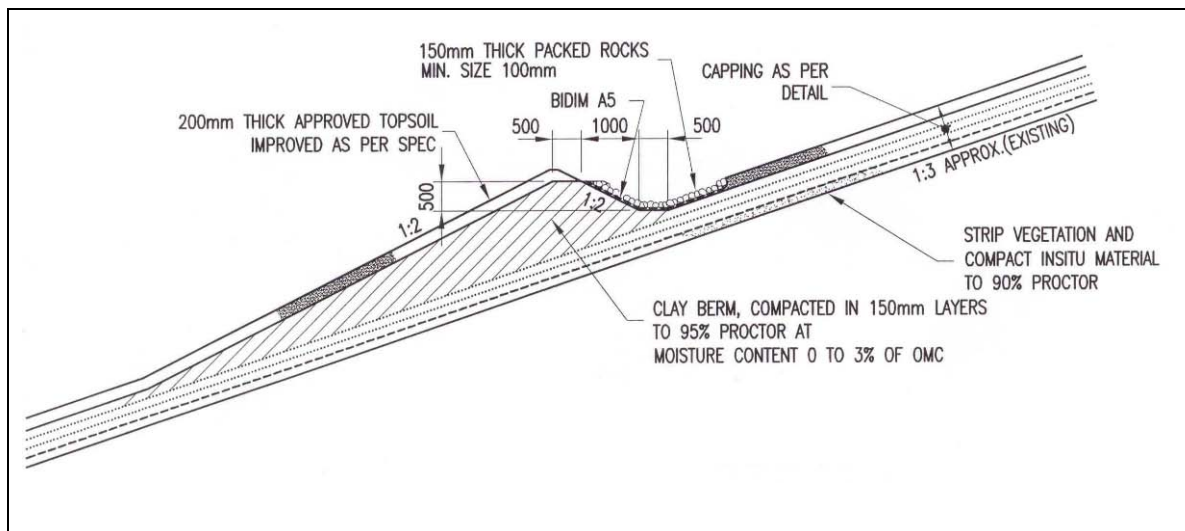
Detail of storm water berm drain (Shamrock, 2002b)
